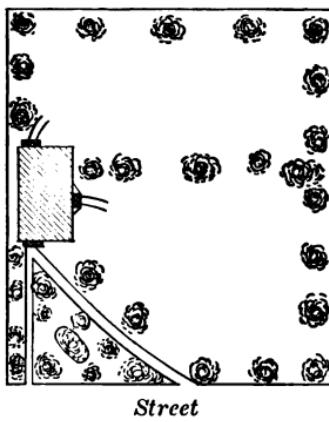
BUILDINGS ARRANGED ON ONE SIDE OF LOT.
